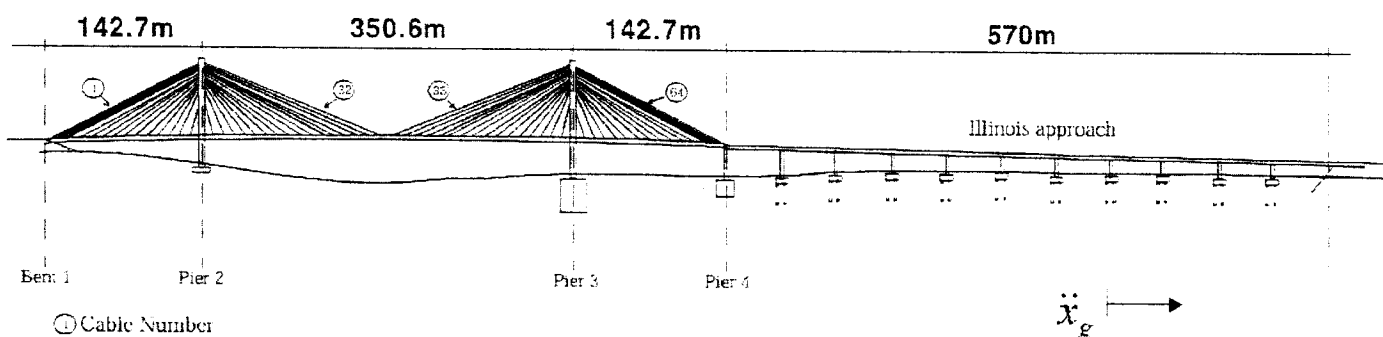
Schematic of the Cape Girardeau Bridge<sup>(7)</sup>
